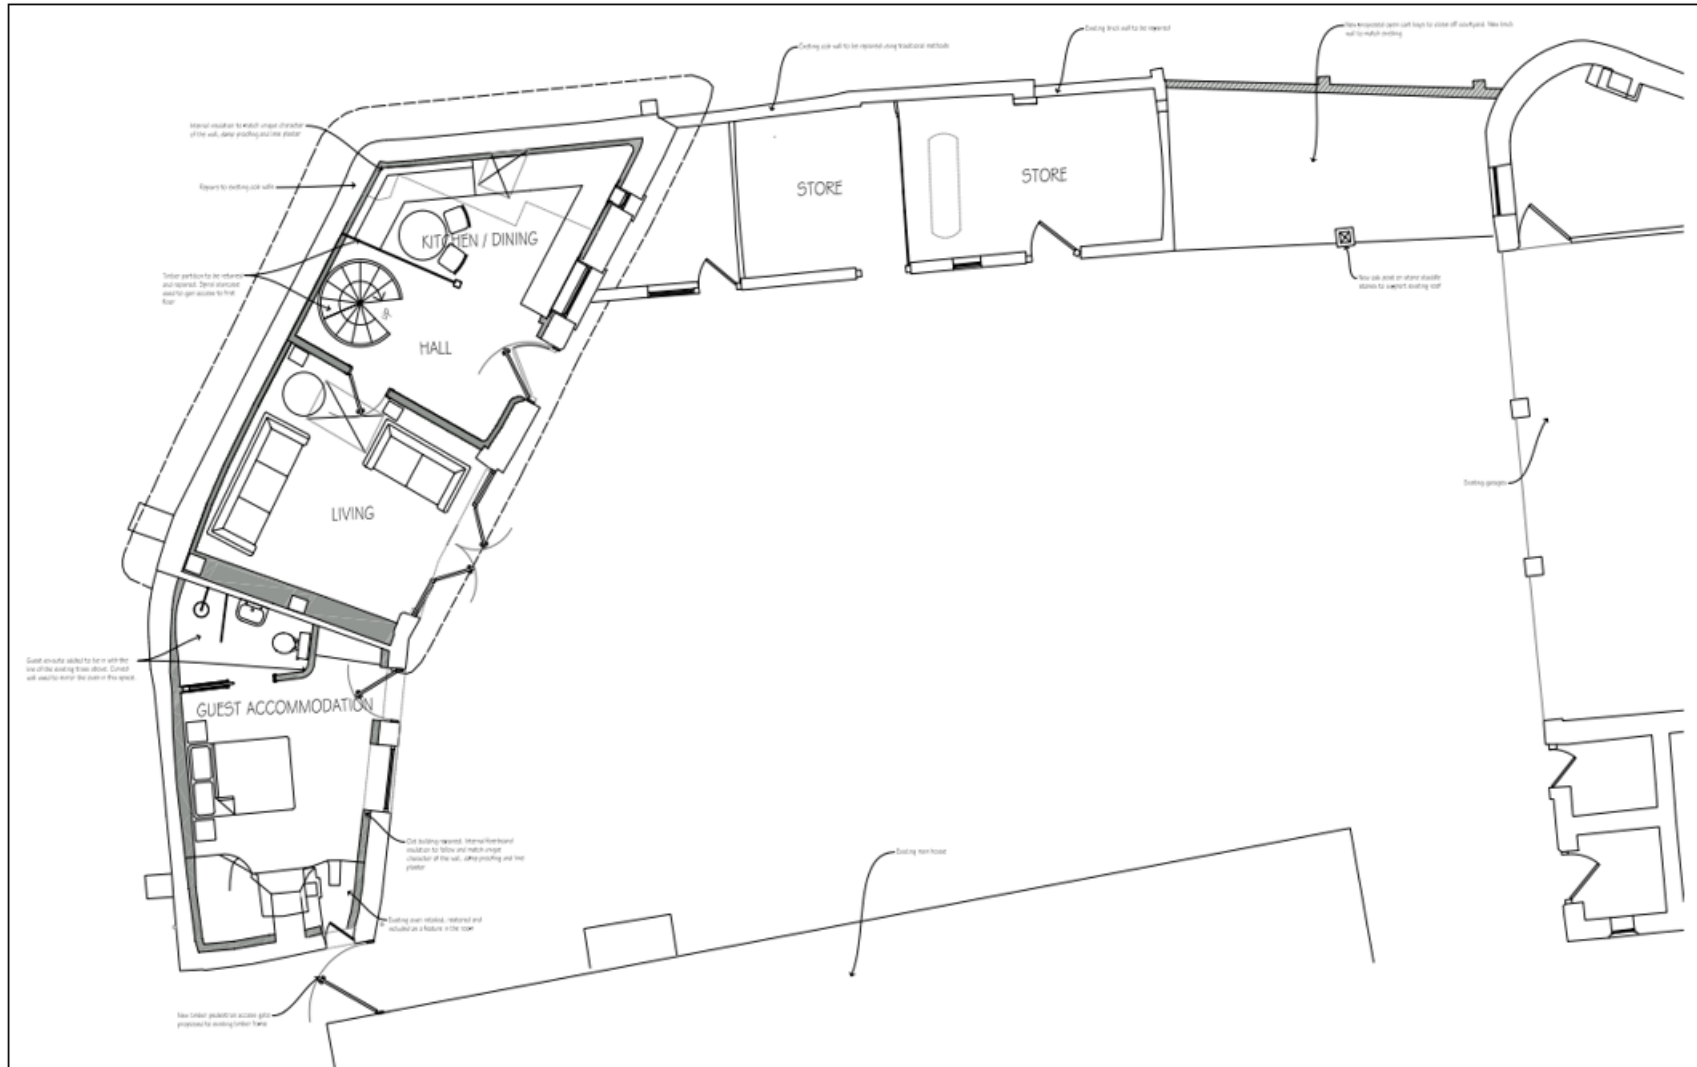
Proposed ground-floor plan of the outbuildings at Bec House (Fowler Architecture and Planning).
